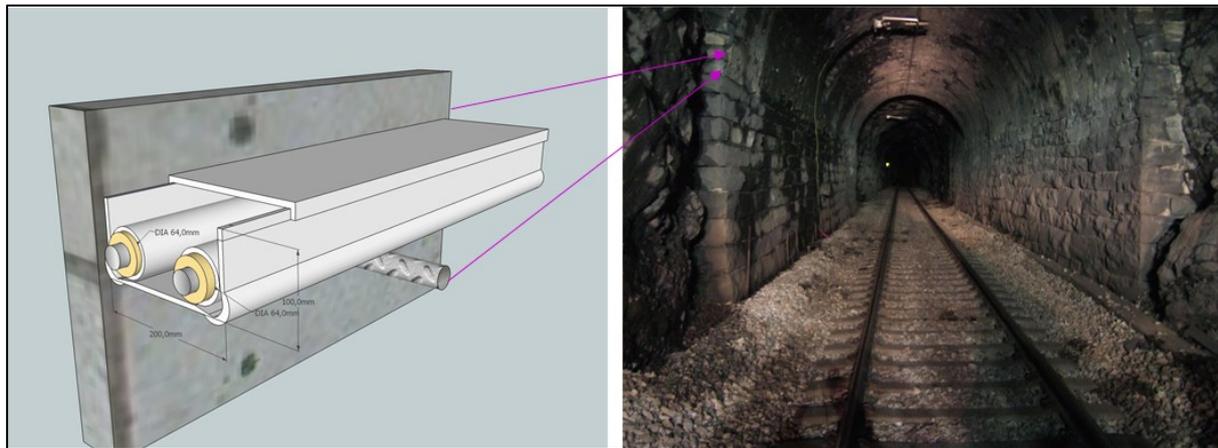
Mounting current cables on the wall of tunnel in Bergensbanen (Egil 2013a)
